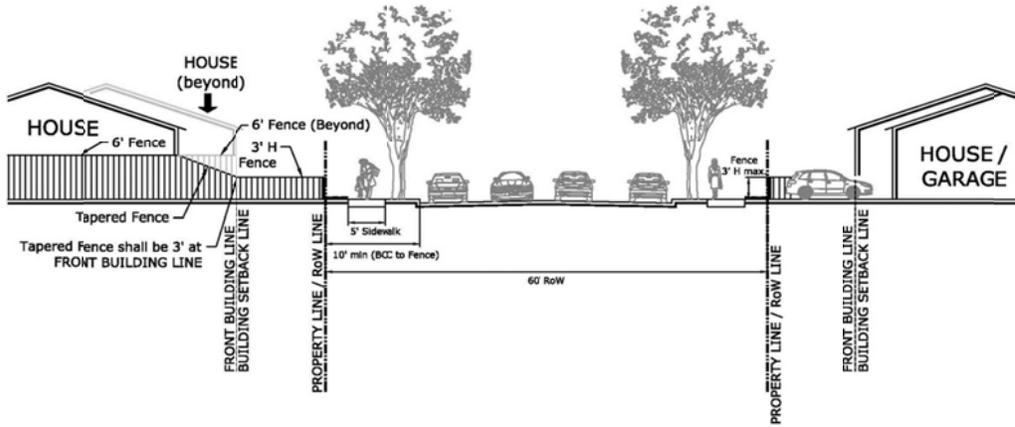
(c) - Typical Cross Section with Landscaped Area and Sidewalk
